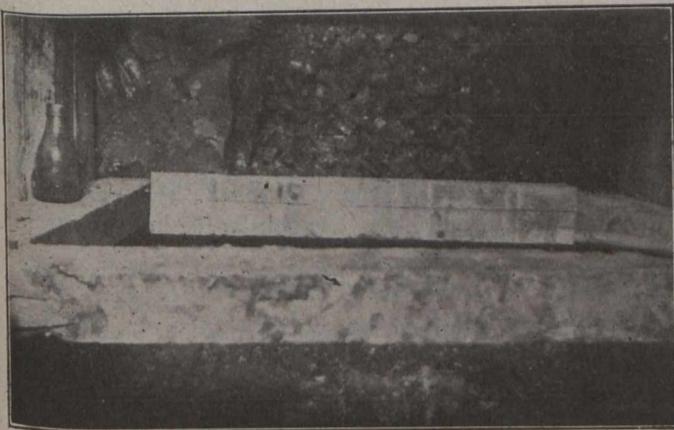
Caisson Under Ten-story Building Had Appearance of Pile of Broken Stone
